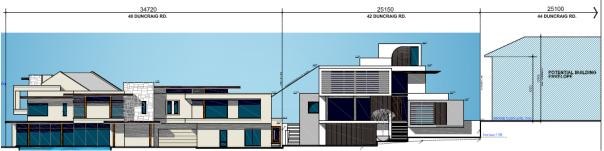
Duncraig Road streetscape with permitted building heights on the adjoining vacant site at 44
